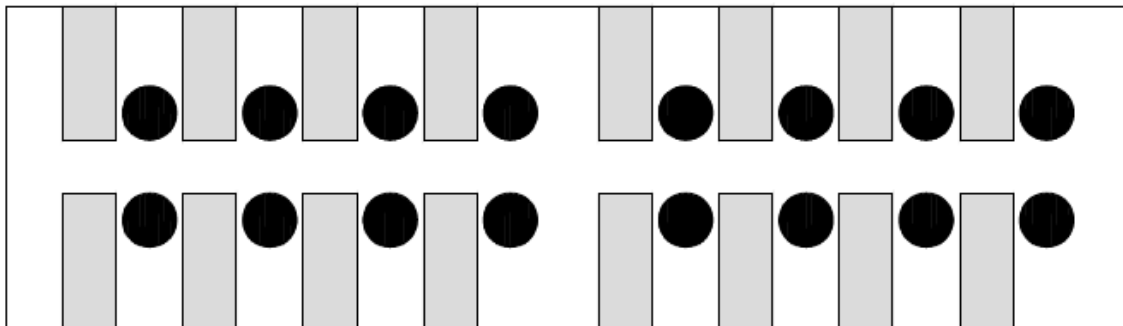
Top View Coring Outline for Beams B1 and B2
